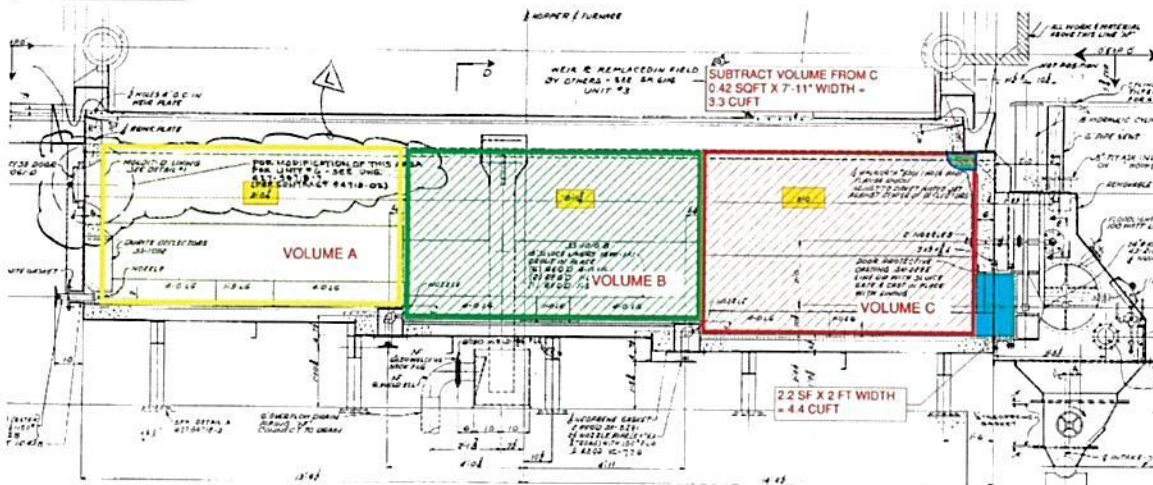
Elevation Bottom Ash Hopper (ref drawing: 427-54718-4)
